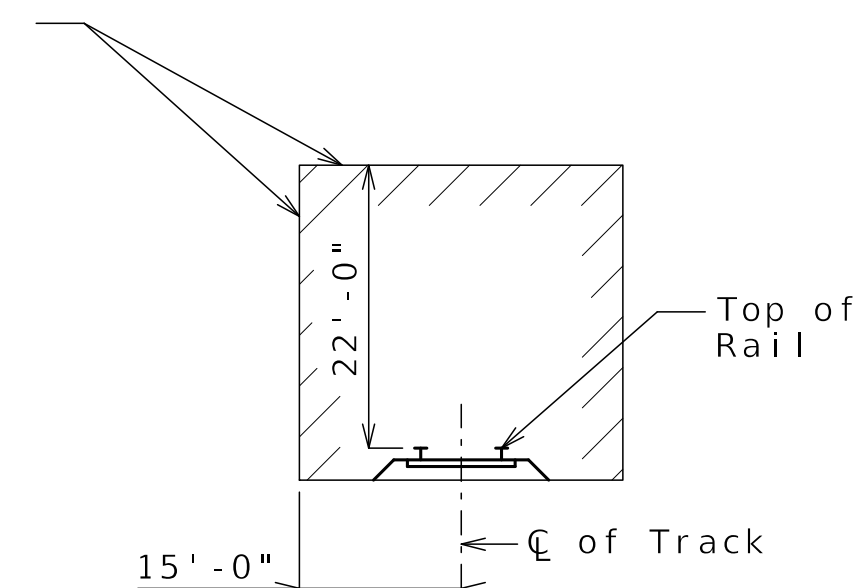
MINIMUM CONSTRUCTION CLEARANCES (Normal to railroad)
